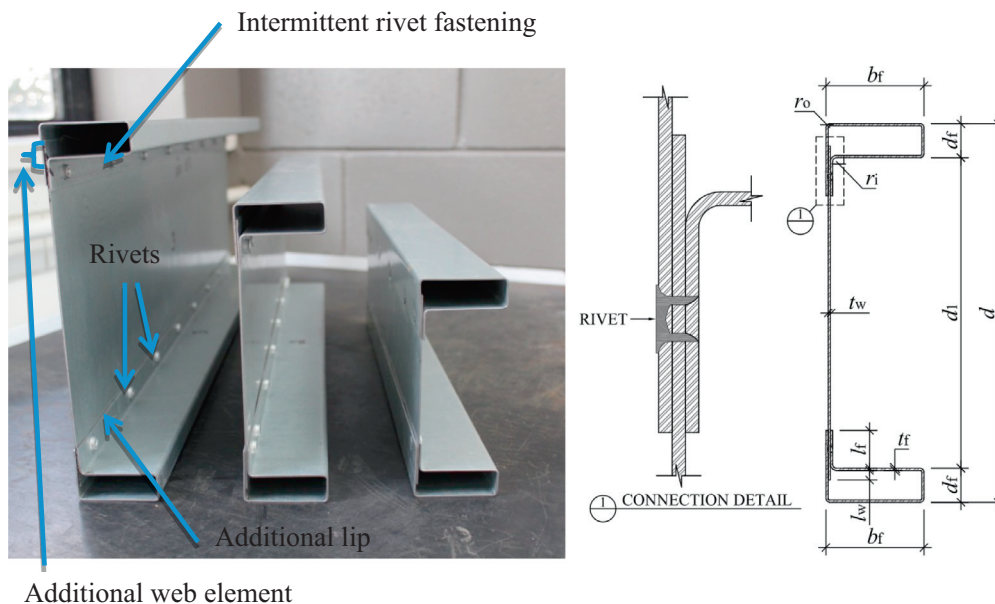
Rivet fastened rectangular hollow flange channel beam.
